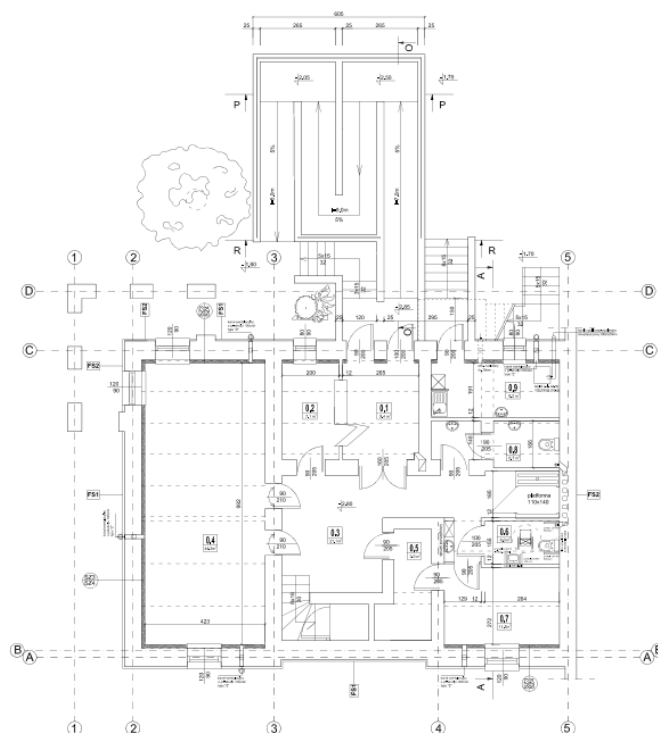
Basement plan (author of the design: architecture Nina Sołkiewicz-Kos; construction: Jarosław Paluszyński and Andrzej Kysiak). To make the building accessible to the disabled in wheelchairs, a ramp was designed – an exit to the basement floor from the west. Access for the disabled people to all other floors of the building will be provided by an internal elevator adapted to the transport of disabled people
